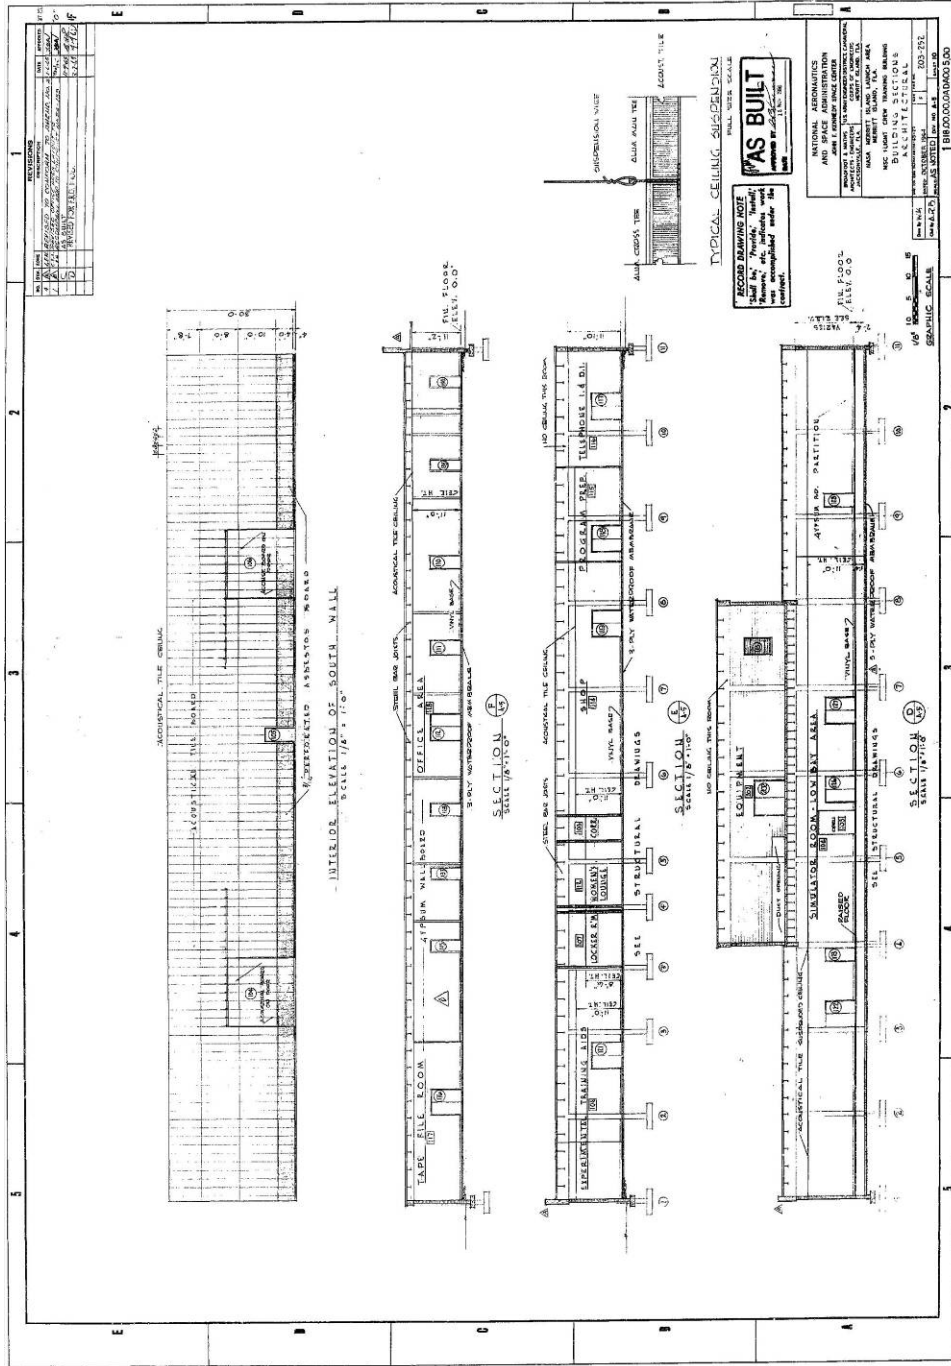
Broadfoot & Mathis, Flight Crew Training Building, Building Sections, October 1964, Sheet 10.
